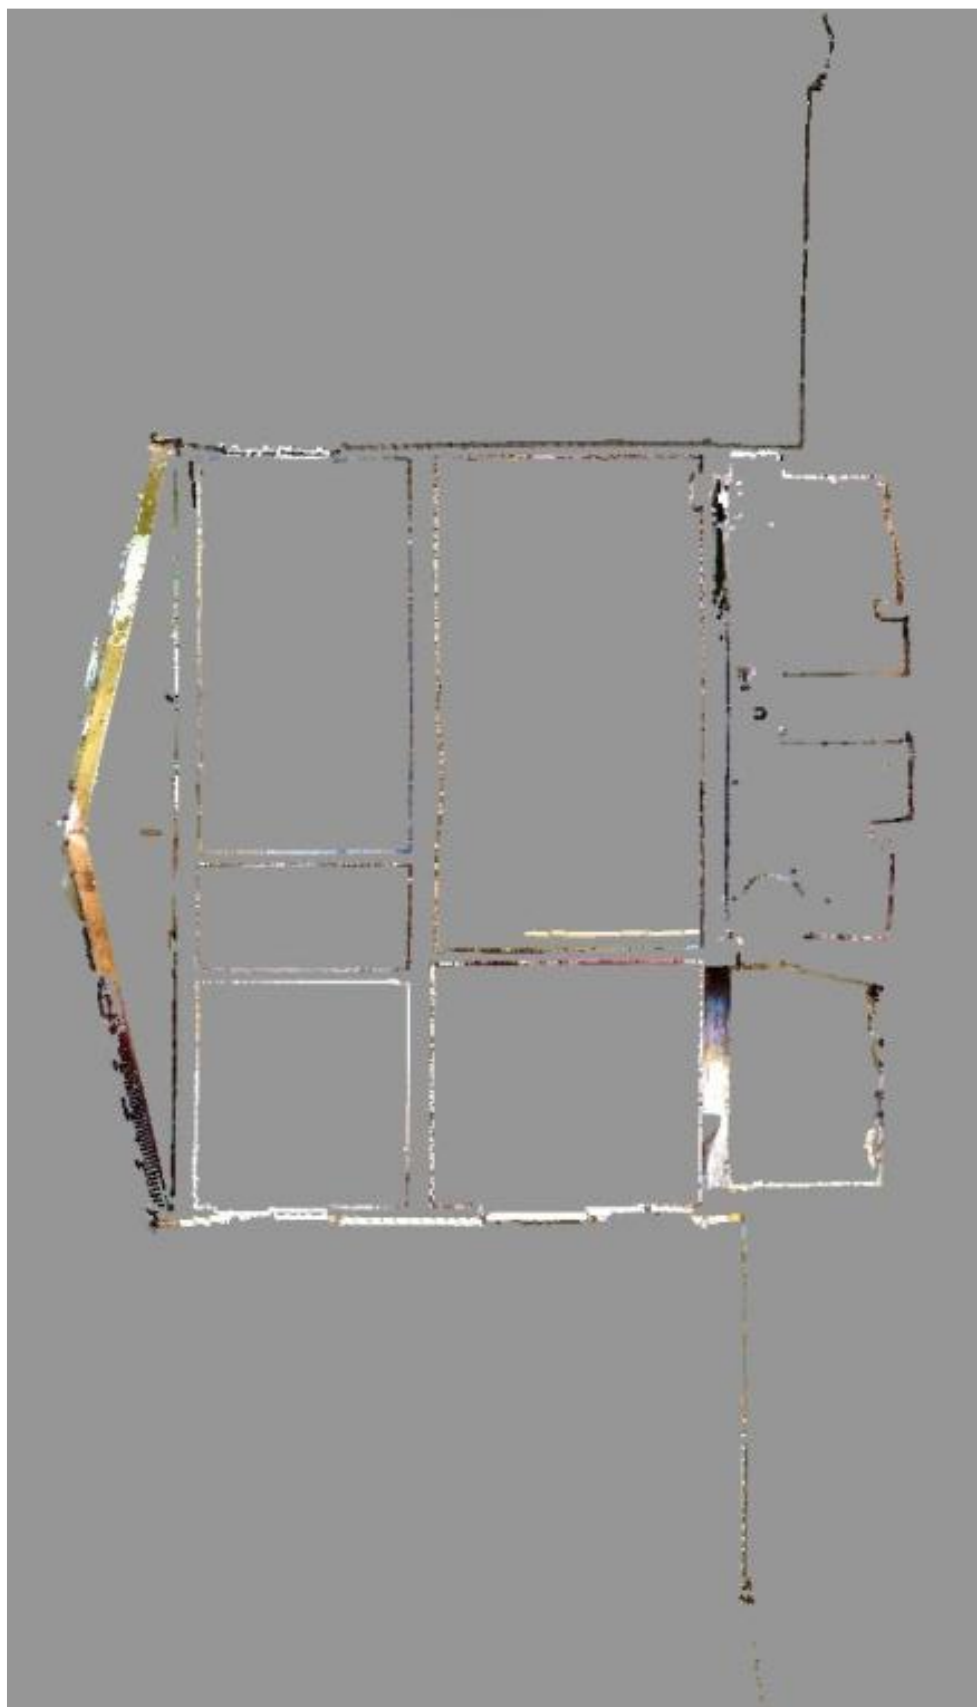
A section view of Campaign Two in Sylvania, facing west.
